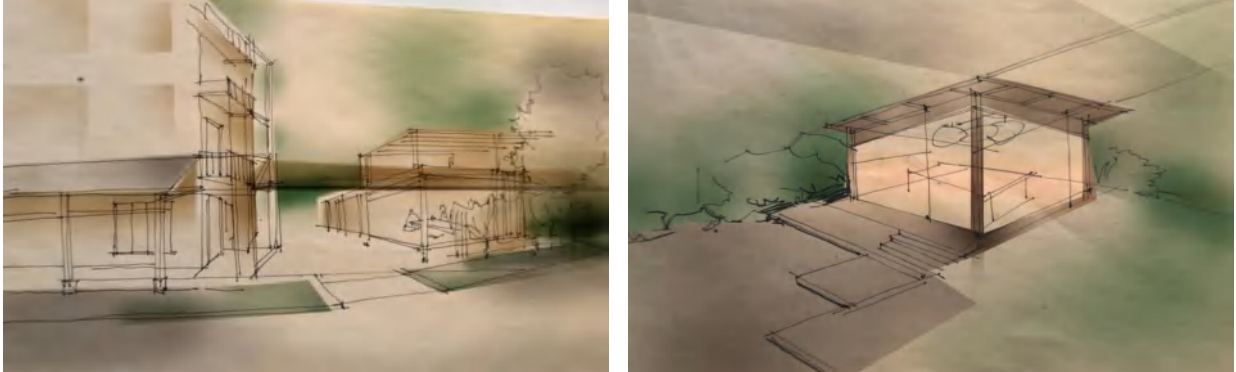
Hand drawing of tea house and fire stairs(Source: author's drawing)
